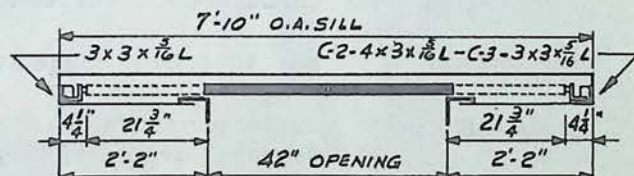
# DETAIL DATA SHEET ——— CENTER-OPENING DOOR
